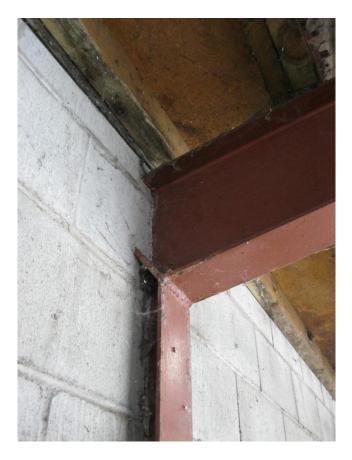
Cracking to masonry wall at the northern end of Wing B.
